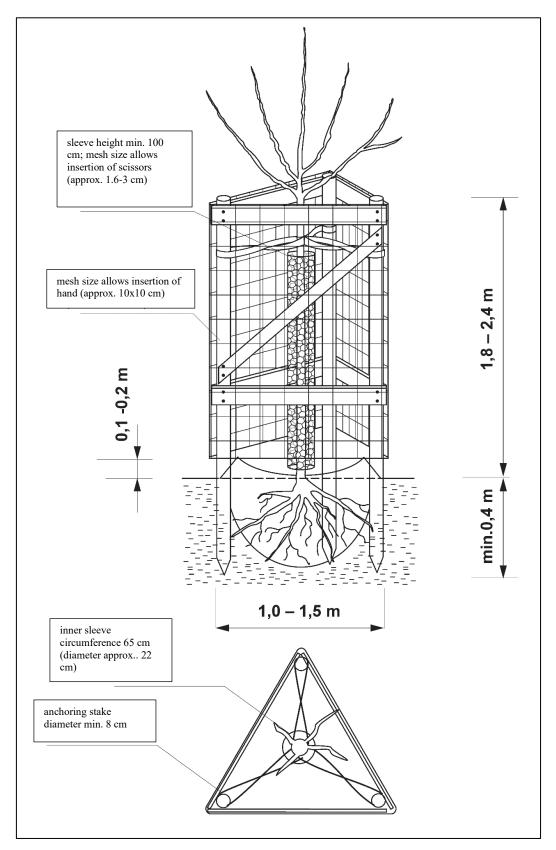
Planting with three-point anchoring, trunk protection and outer protective layer. Illustration: Martin Feikus
